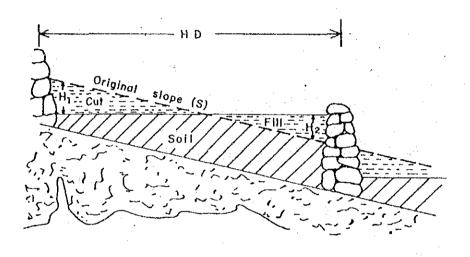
Sketch of Bench Terrace Constructed by Excavation and Fill
